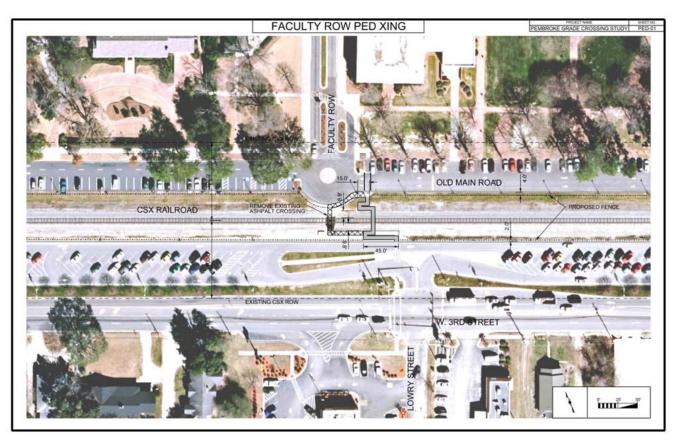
Proposed Z-Crossing of Railroad Tracks at Faculty Row
